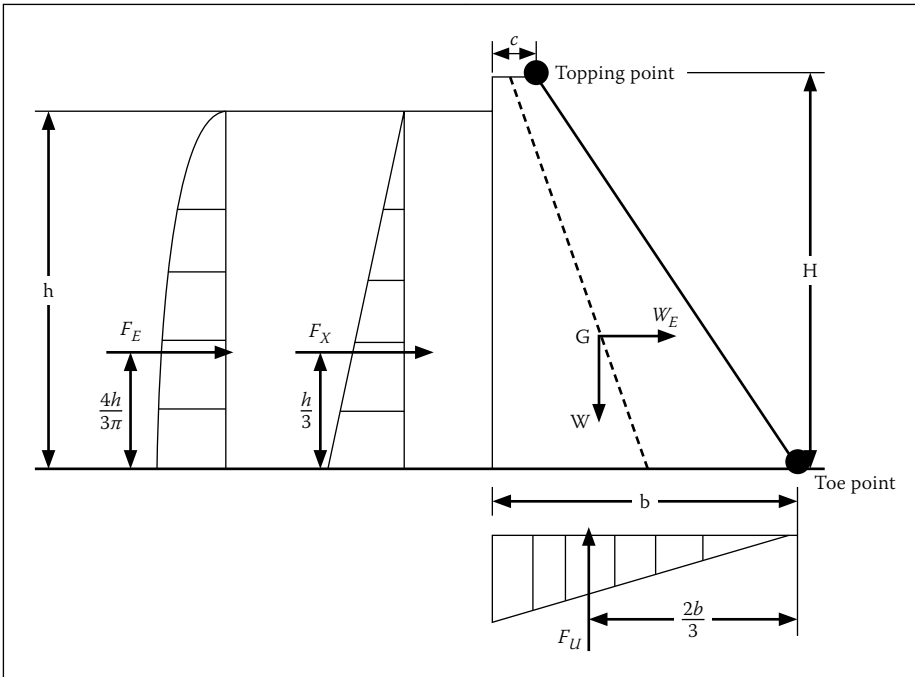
The forces on a concrete gravity dam under earthquake conditions
